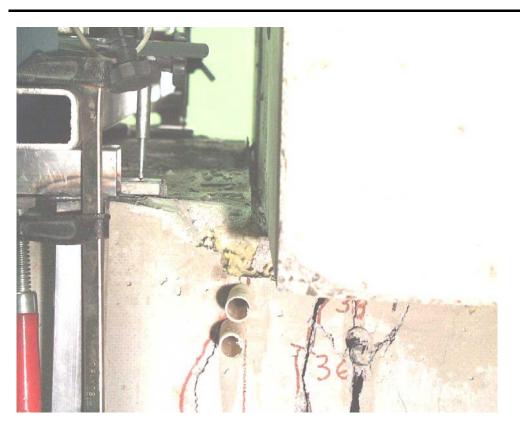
Cracking in upper wall element after failure seen from north.
